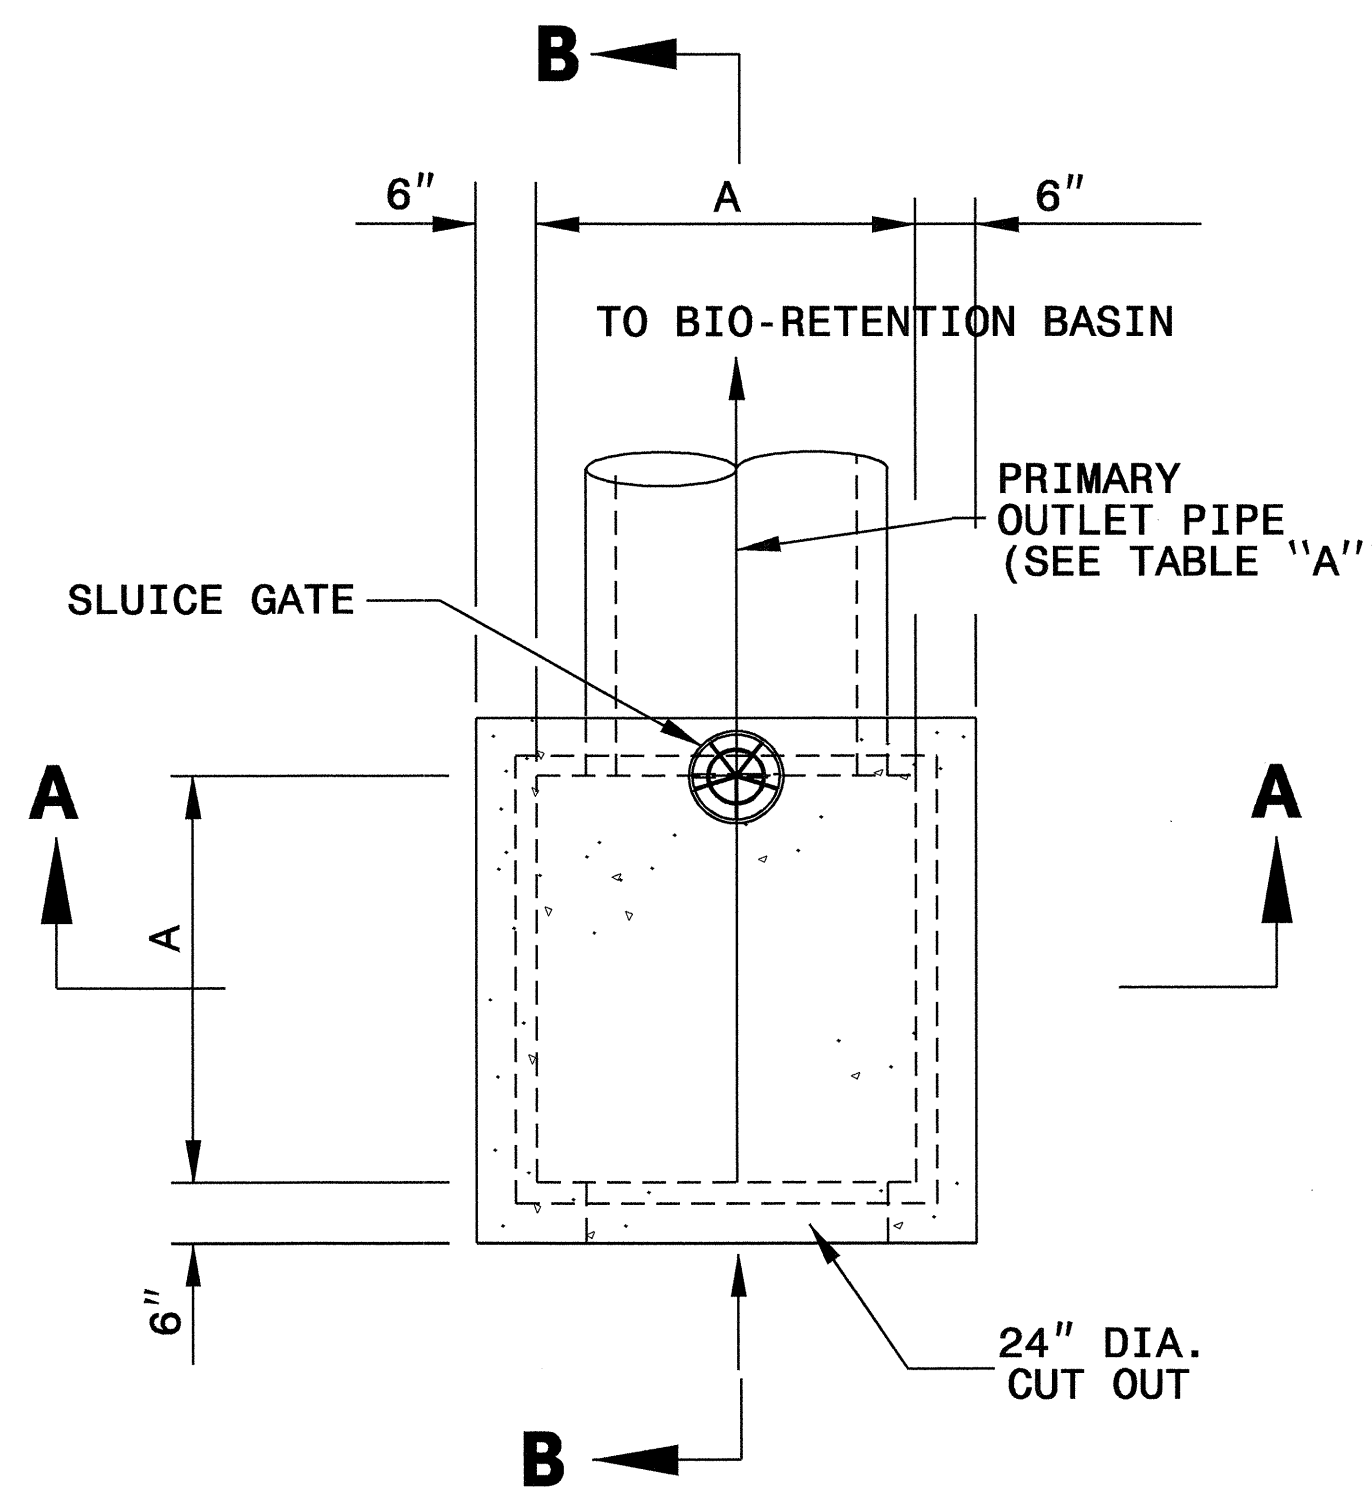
### DETAIL OF OUTLET HAZARDOUS SPILL BASIN
